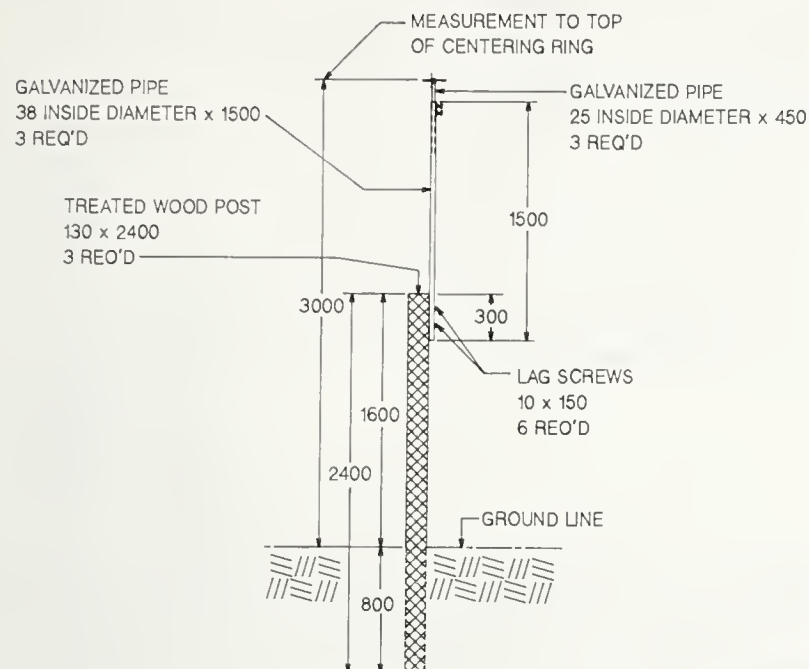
Fabrication plans showing wooden post, galvanized pipe, and centering ring used to support the modified Alter windshield; dimensions are in millimeters.
